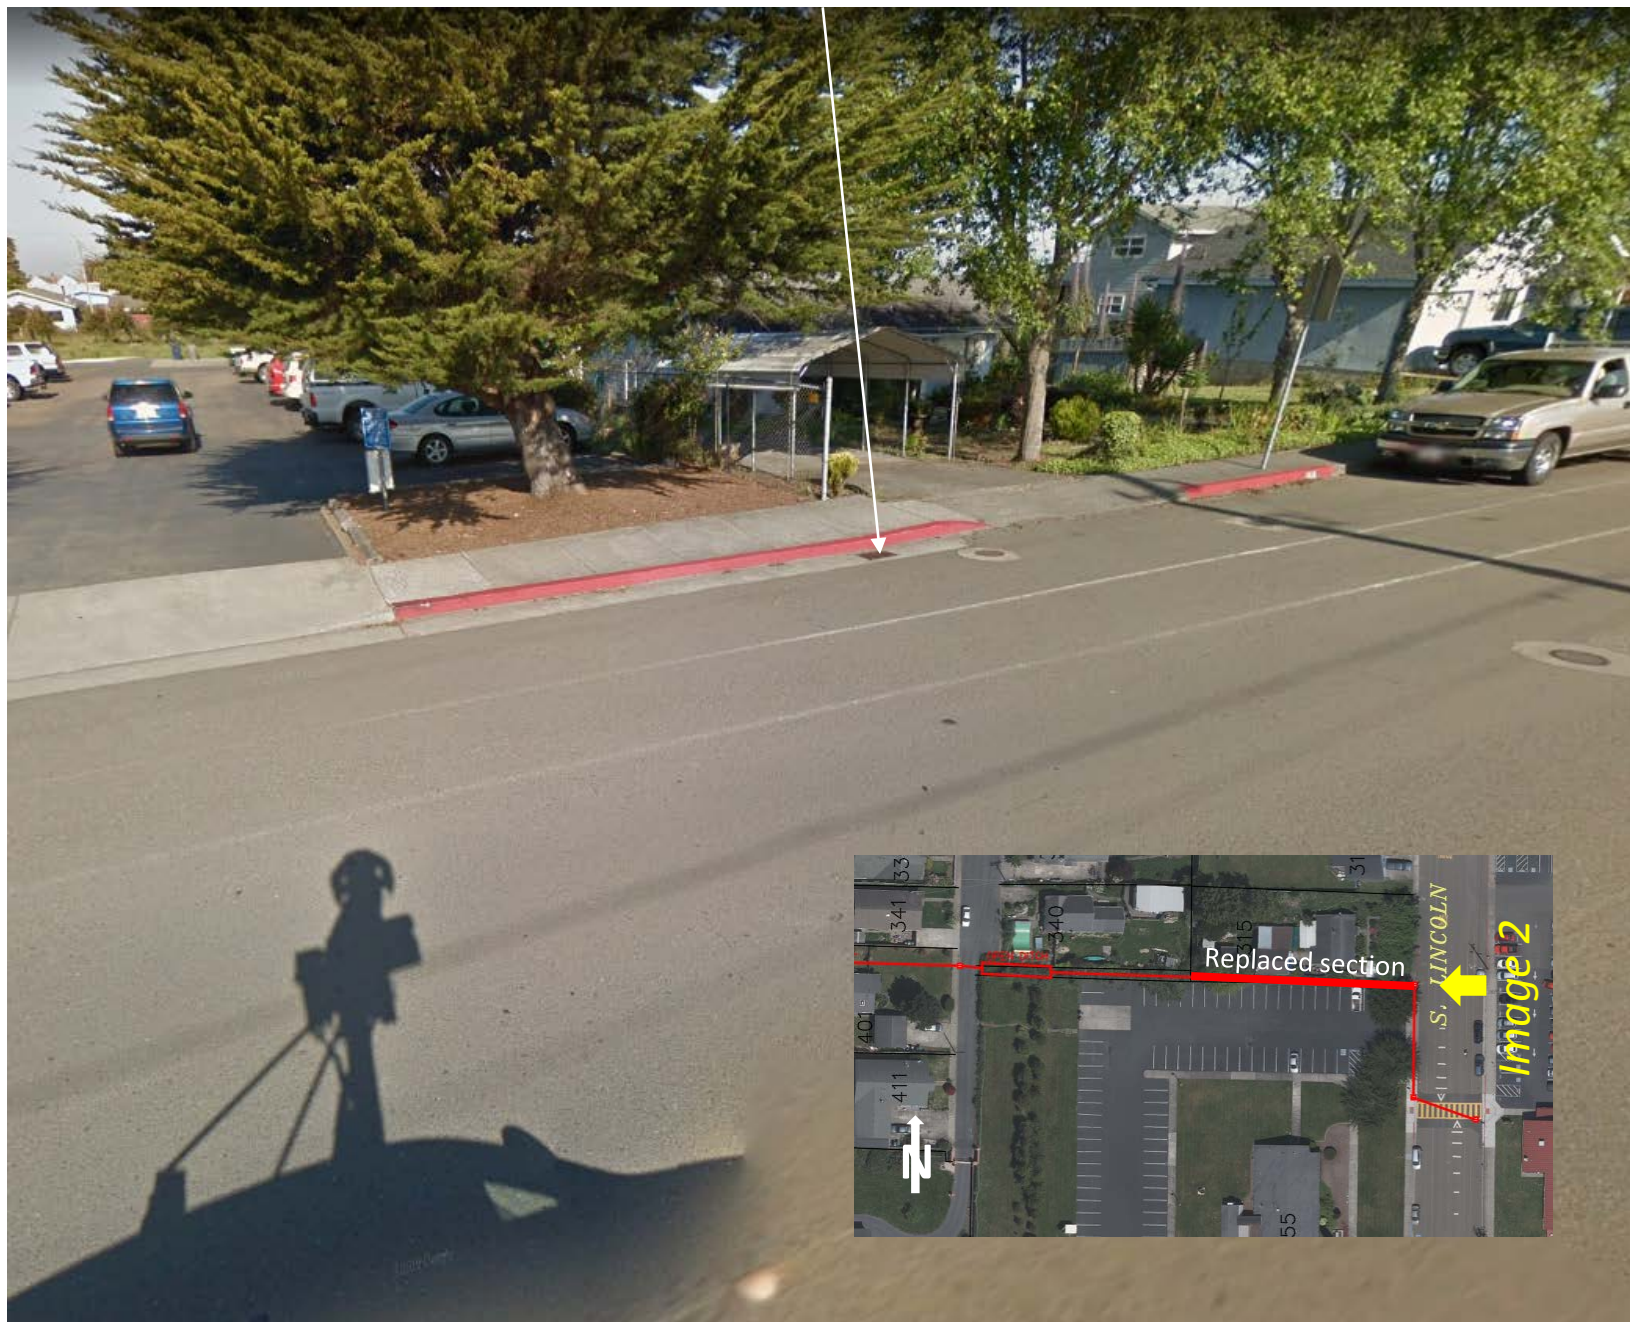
West end of drainage from S Lincoln, and southernmost inlet on Park - view looking south – owner of 340 Park has been asking for new pipe since April of 2018
